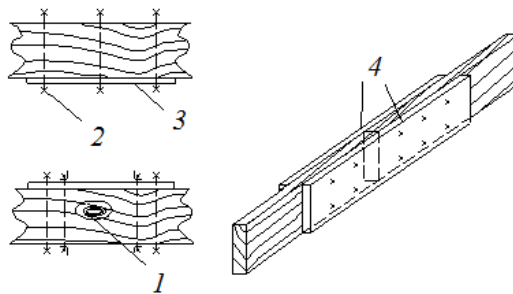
Local strengthening of beams: transversal cracks [12]:
